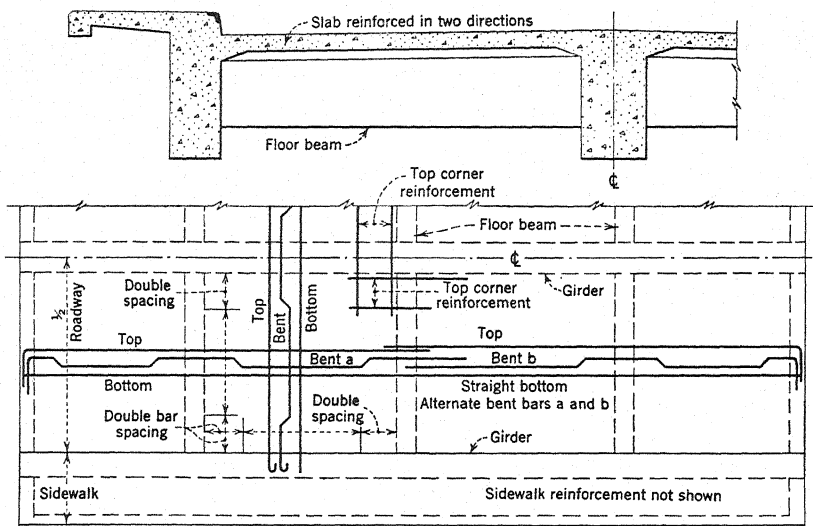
Bridge Floor Design: Slab Reinforced in Two Directions. (See p. 75.)
